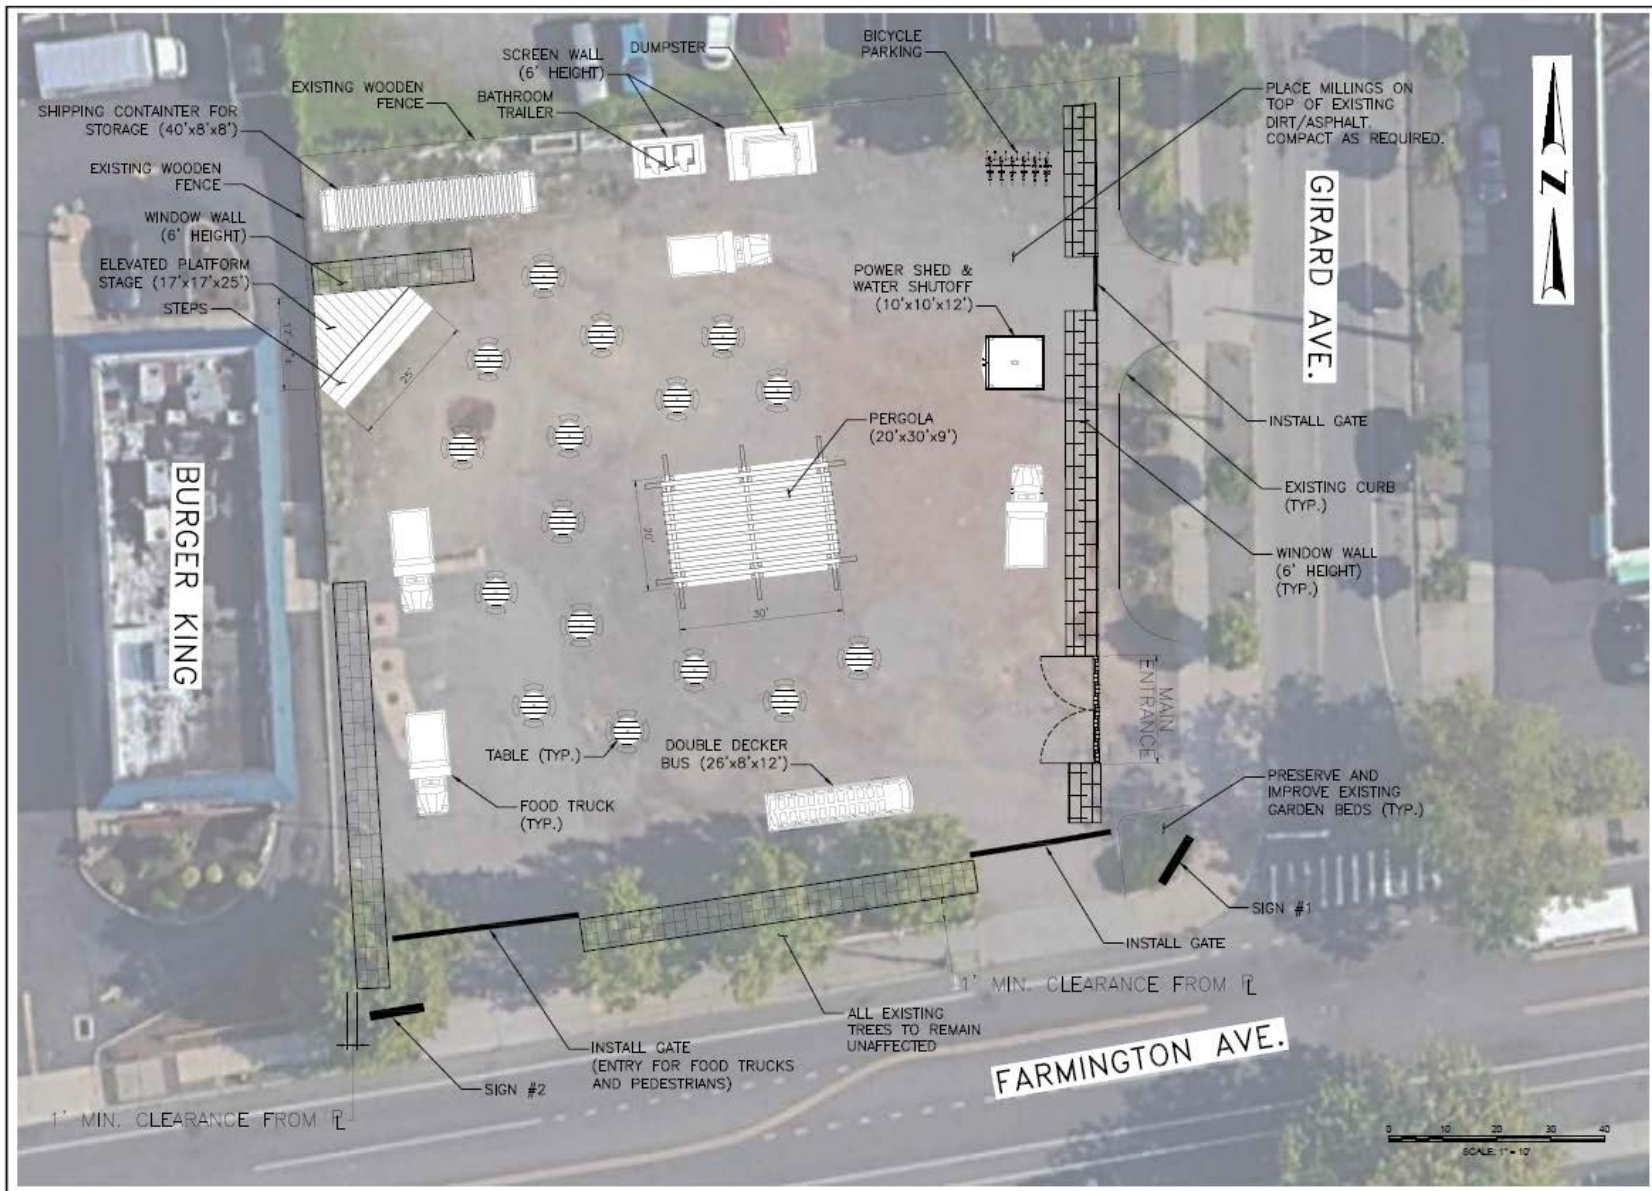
Proposed site plan, submitted by Rebeca Quach, dated February 15, 2022.
